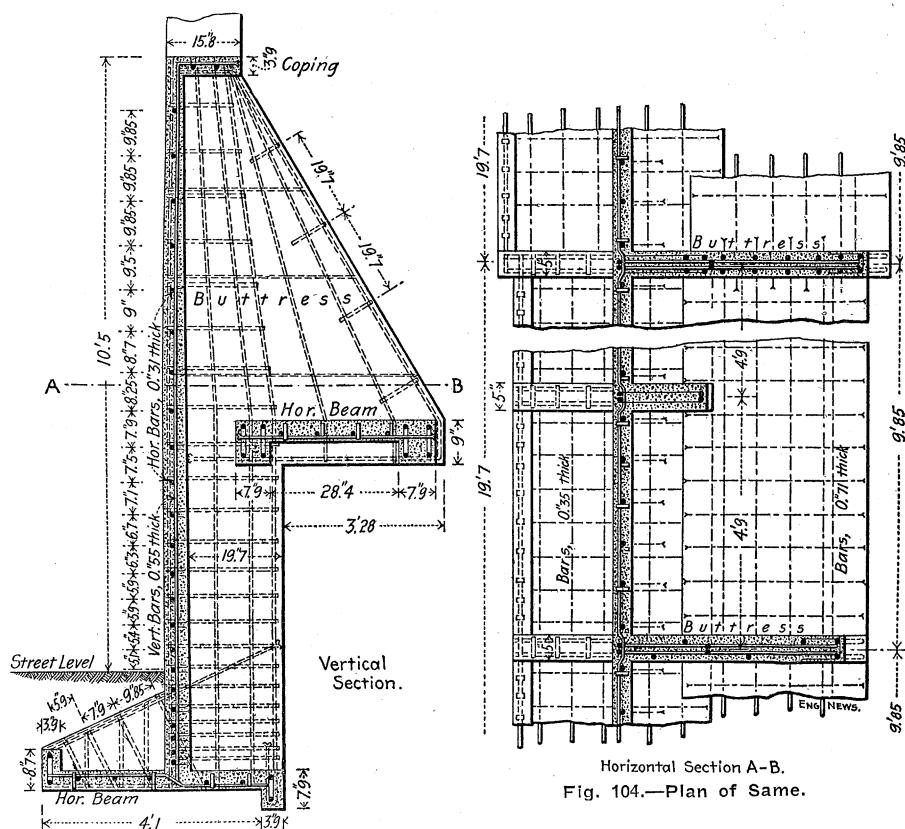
Section of Retaining Wall Used at Paris Exposition, Hennebique System.
